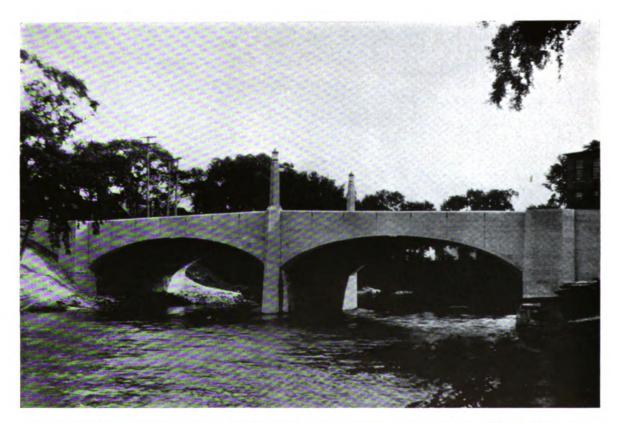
Canal Street Bridge, Nashua, New Hampshire. 25 tons Celite used on job. Fred T. Ley & Co., Inc., Springfield, Massachusetts, Contractors; J. R. Worcester & Co., Boston, Massachusetts, Engineers
